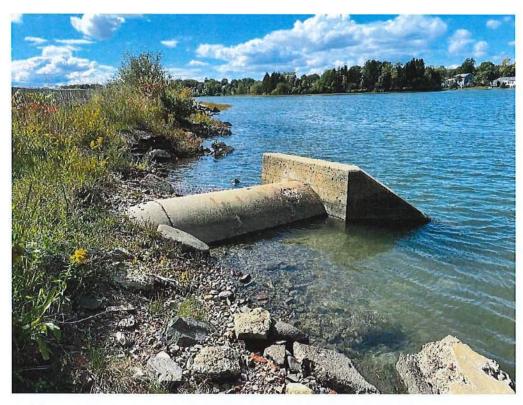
Existing outfall headwall, exposed 48" RCP pipe, and tidal embankment looking west at high tide. Taken 9/28/22
